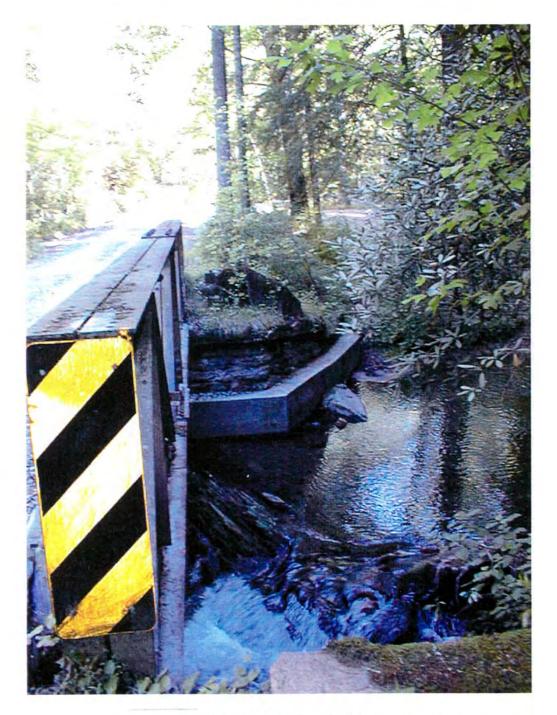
Bridge No. 2, abutment showing concrete support wall. View W.
